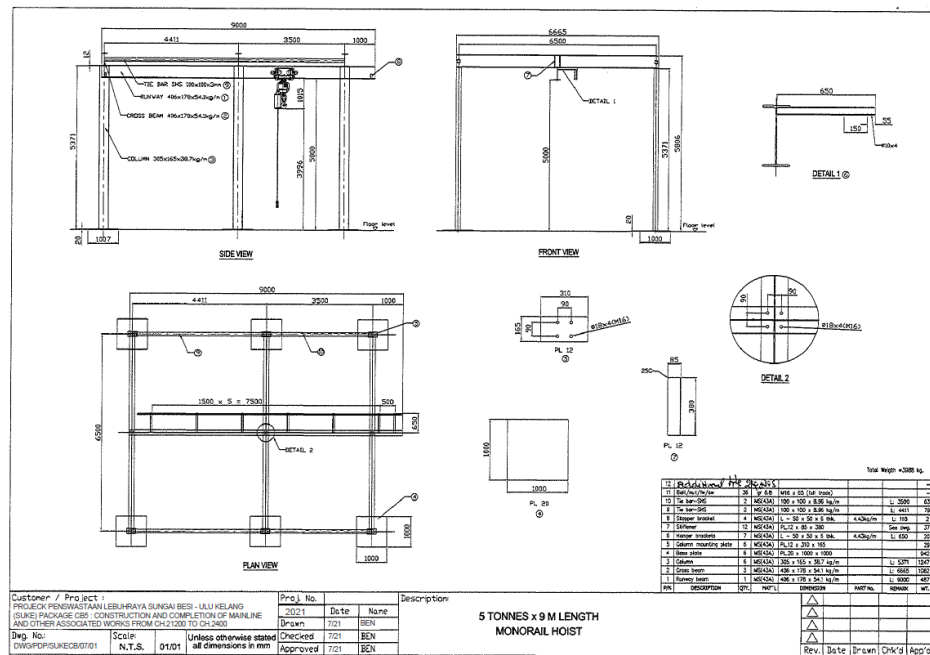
5 tonnes monorail hoist gantry crane detail
